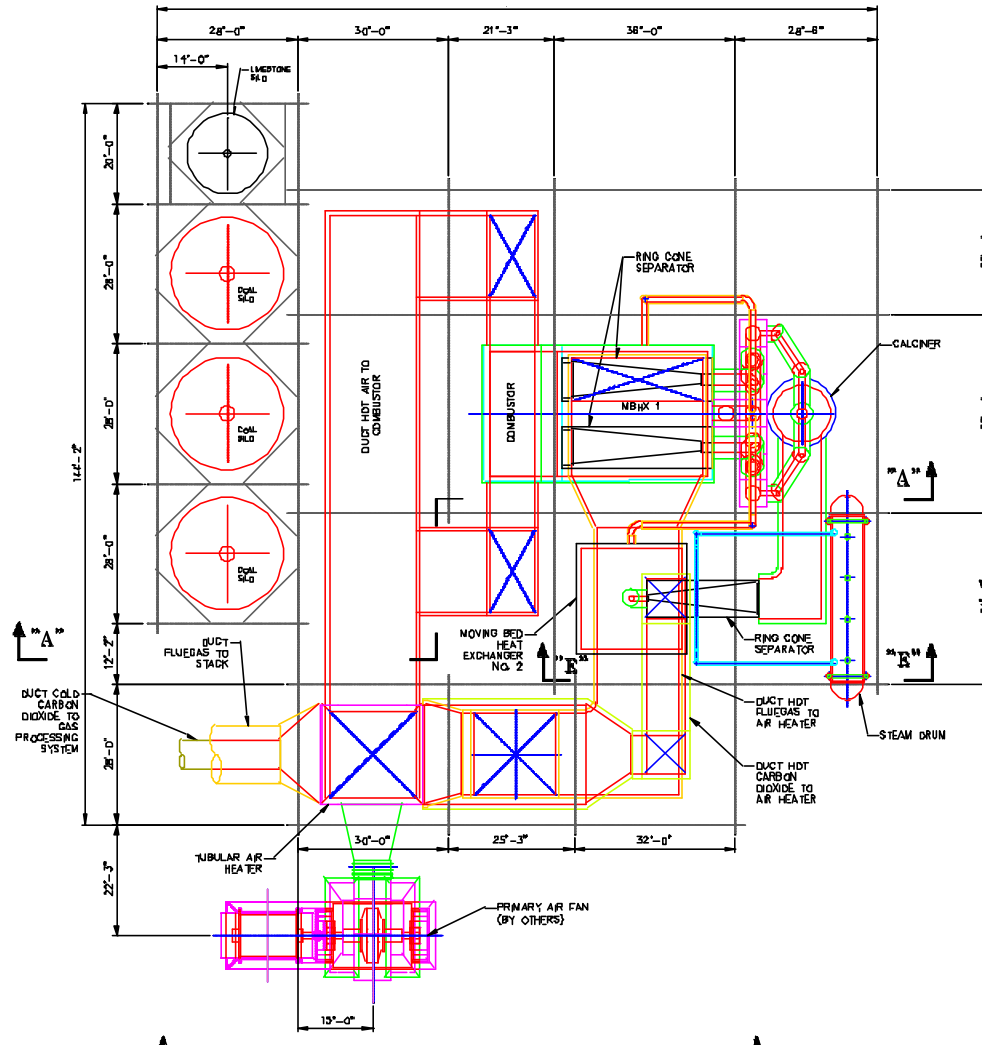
3: Case-5 Boiler Island General Arrangement Drawing – Plan View
